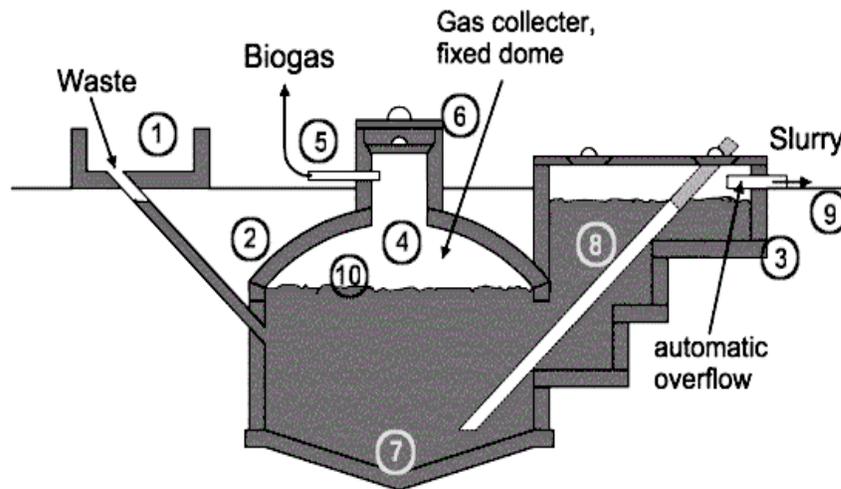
Fixed dome plant Nicarao design: 1. Mixing tank with inlet pipe and sand trap. 2-Digester. 3. Compensation and removal tank. 4. Gasholder. 5. Gas pipe, 6-Entry hatch, with gastight seal. 7. Accumulation of thick sludge. 8. Outlet pipe. 9. Reference level. 10. Supernatant scum, broken up by varying level
